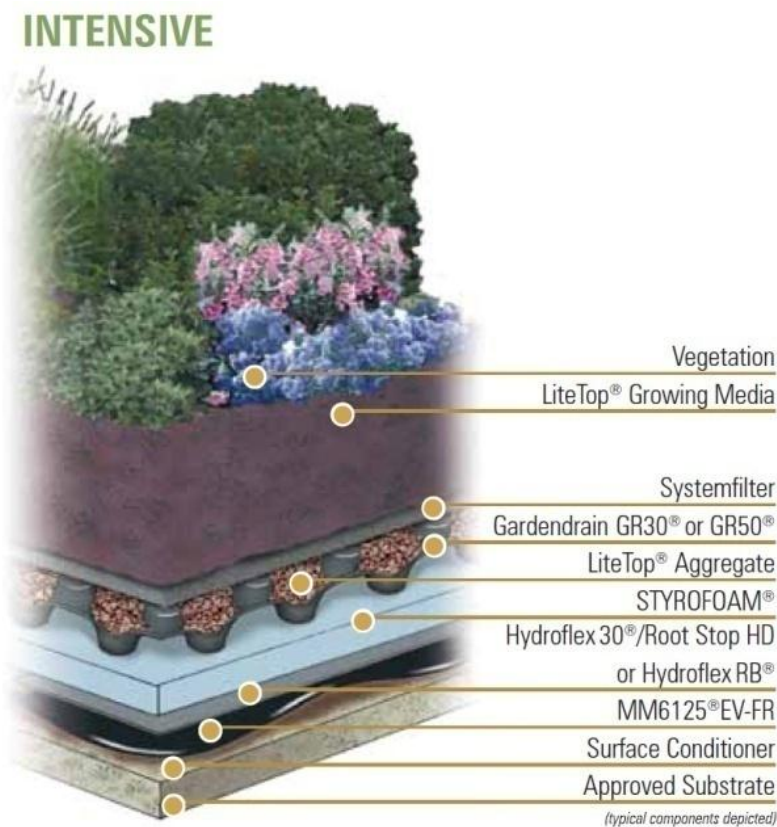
Demonstrates a Typical Green Roof Provided by Hydrotech
